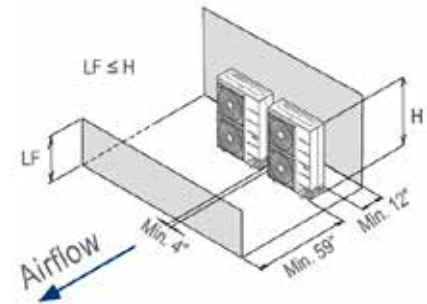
Double Row Units—low rear and front walls with no side walls or overhang
